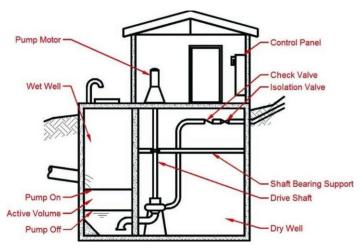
Schematic Drawing of Separated Wet Well and Dry Pit Pump Station
